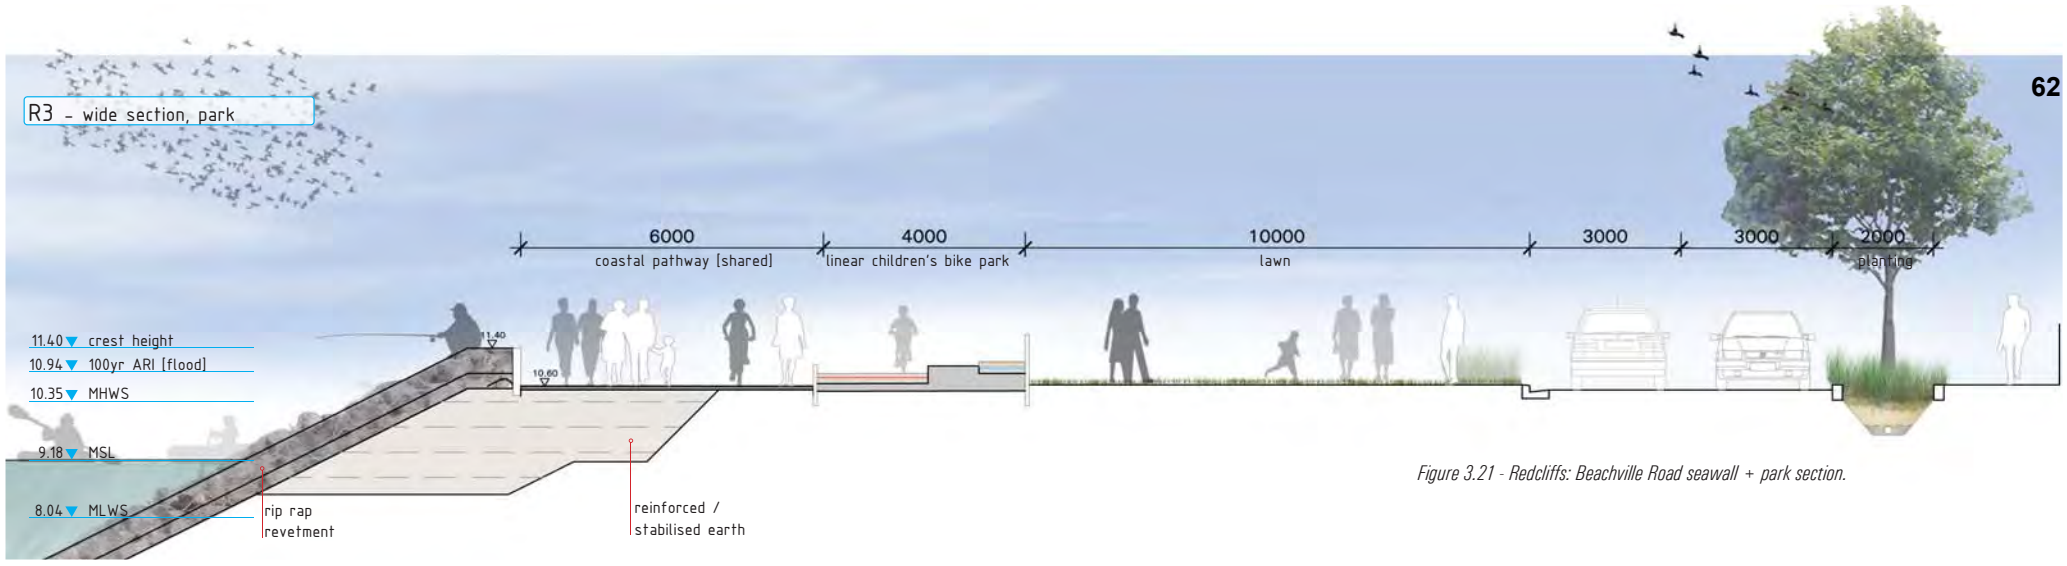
Redcliffs: Beachville Road seawall + park section.
